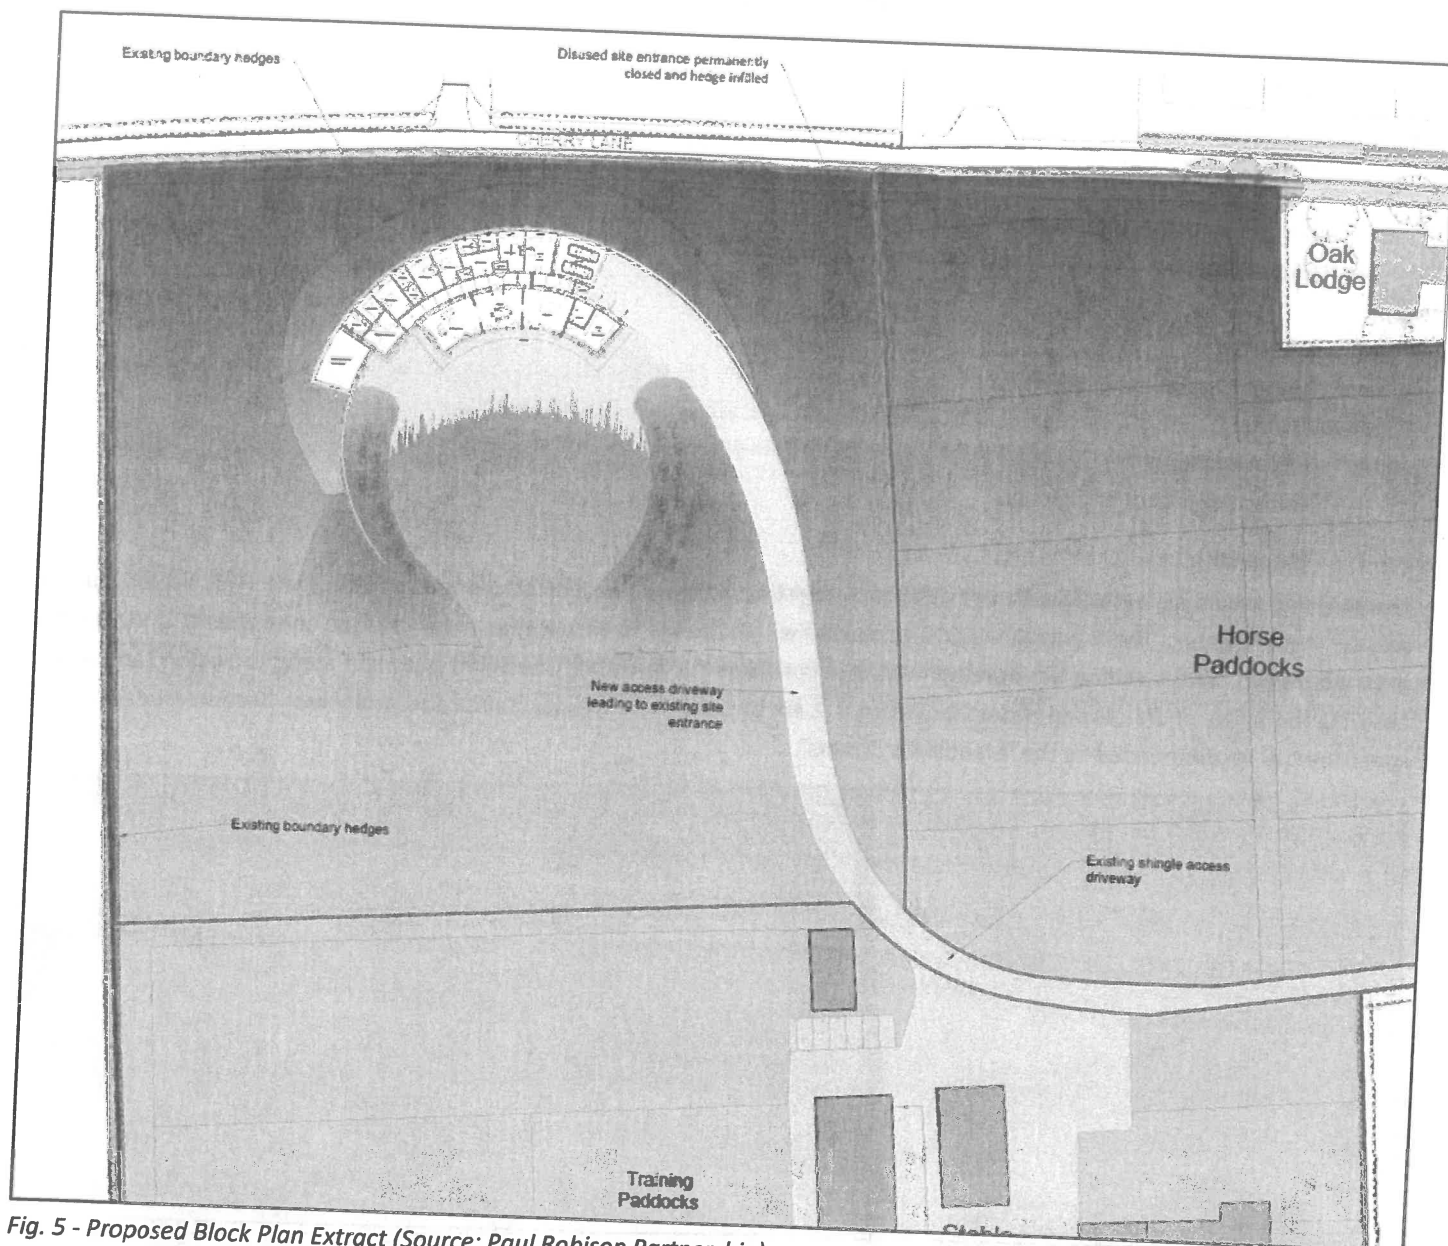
Proposed Block Plan Extract (Source: Paul Robison Partnership)
